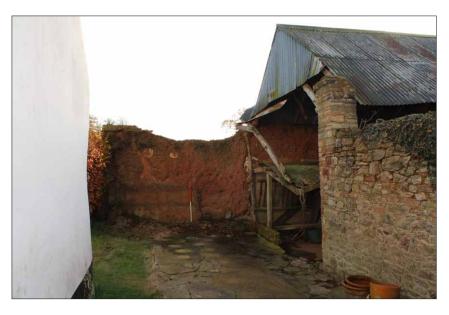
East end of the linhay showing how the south elevation continues beyond the current roof, looking south (1m scale)
